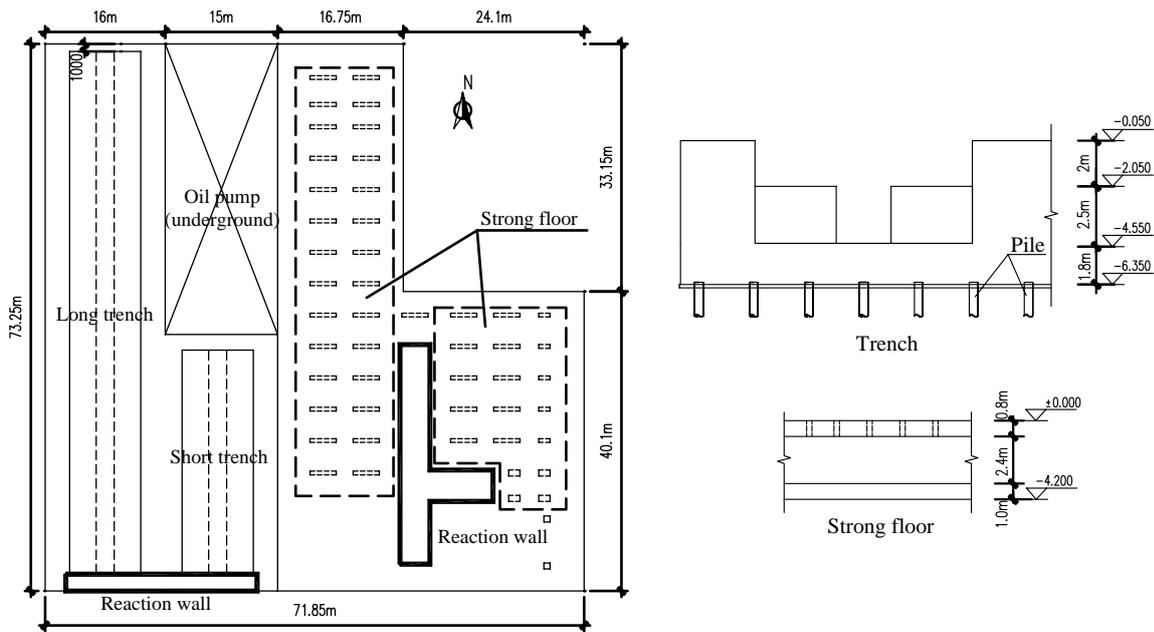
Layout of the large mass foundation and section of the trench and strong floor
